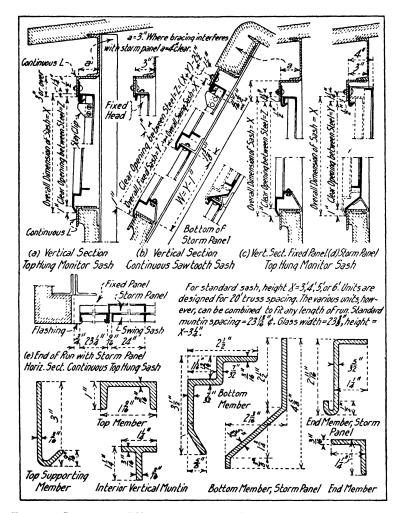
DETAILS OF "UNITED STEEL SASH" VENTILATORS AND SKYLIGHTS.
